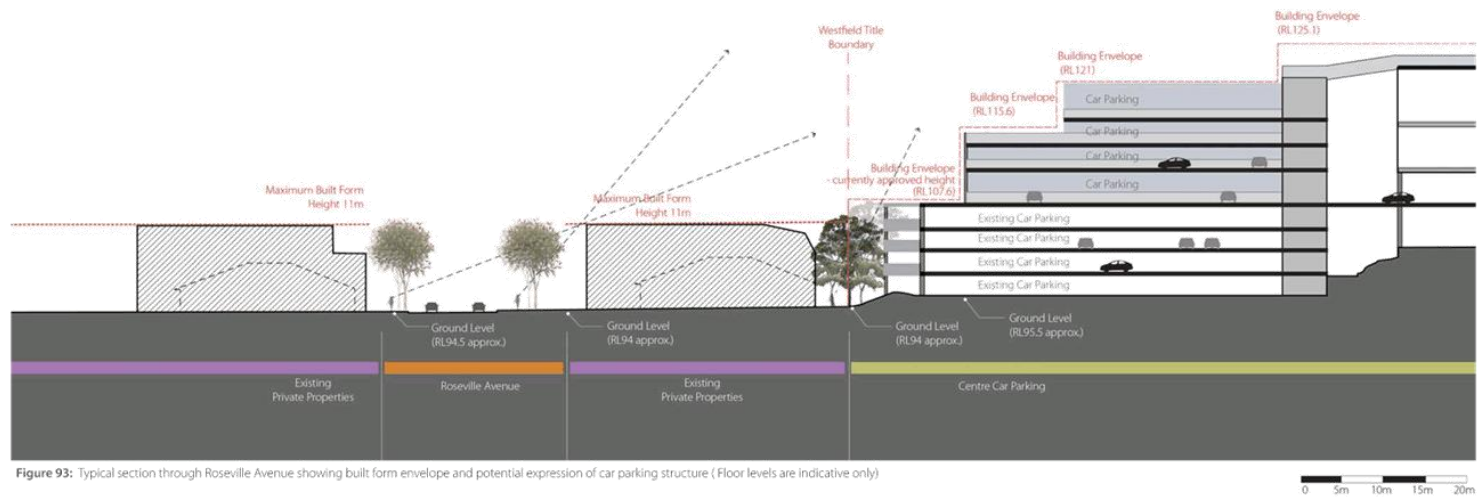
Typical section through Roseville Avenue showing built form envelope and potential expression of car parking structure (Floor levels are indicative only)
